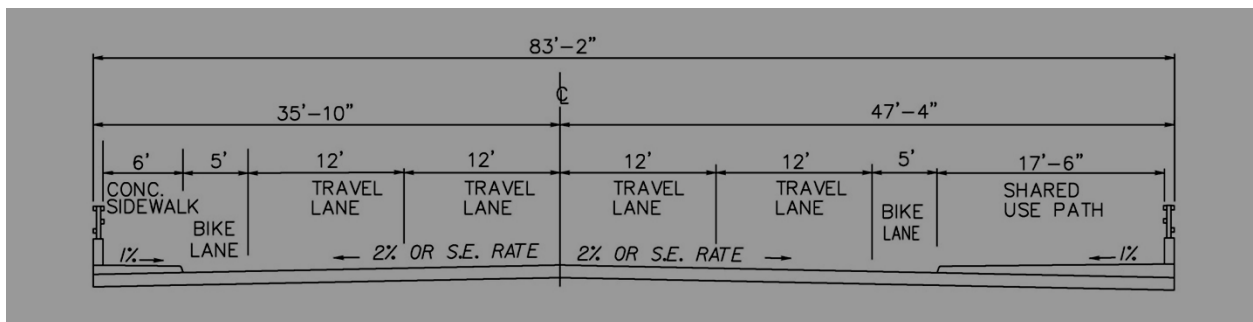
Typical Section used in the “Soapstone Connector” Feasibility Study for the bridge over the Dulles Toll Road and Dulles International Airport Access Highway.
